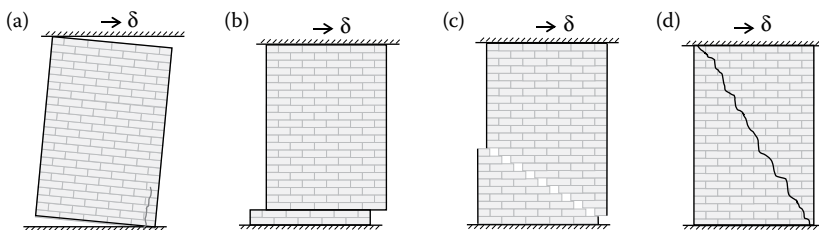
Typical in-plane failure mechanisms for unreinforced masonry walls or piers: (a) rocking, (b) sliding, (c) sliding-shear, (d) shear.
